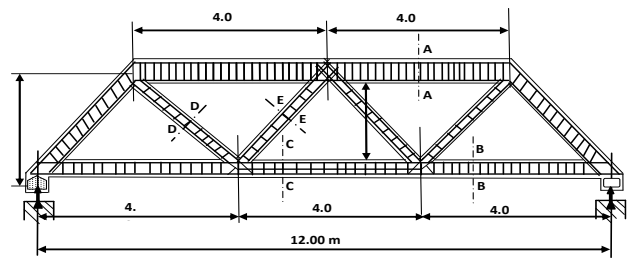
Construction details of the lattice truss structure with upper and lower frames
